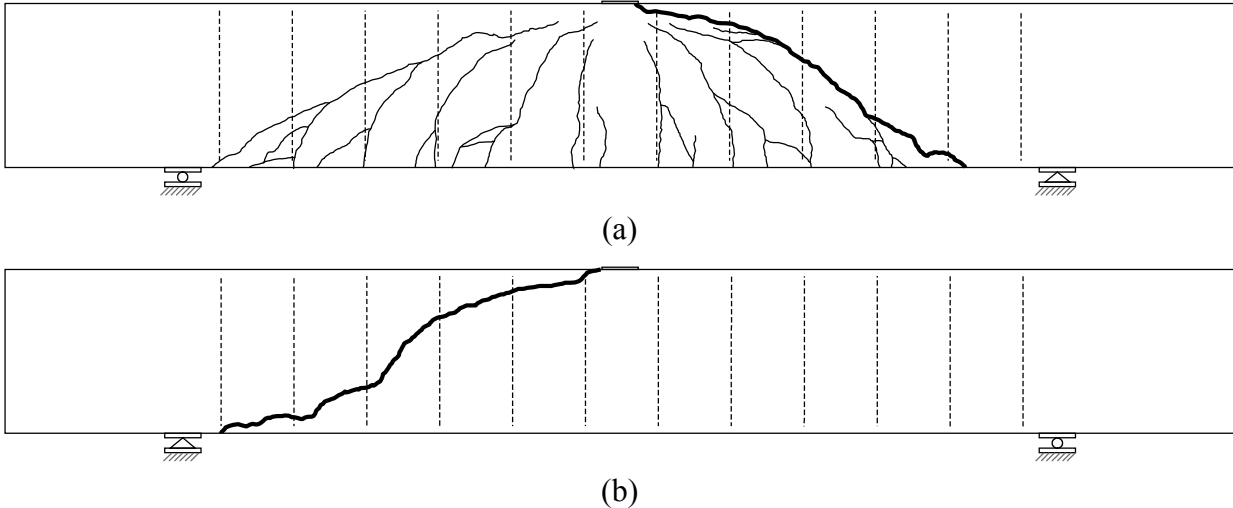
Observed damage in specimen P3S10, (a) front side, (b) back side
